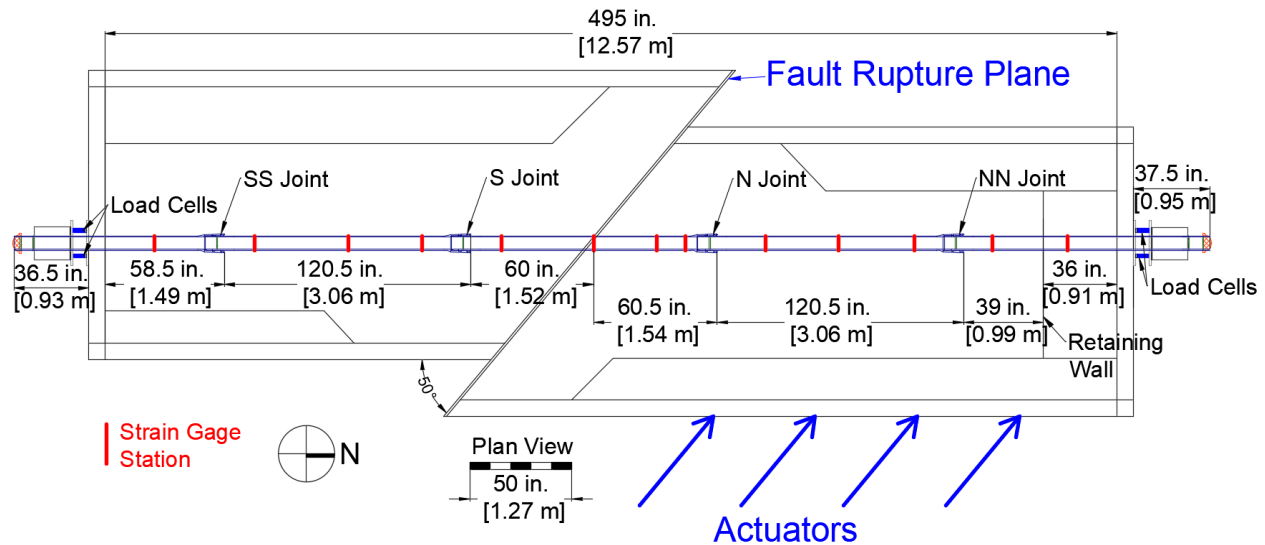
Plan View of US Pipe Ductile Iron Pressurized Pipe Centered Specimen in Test Basin
